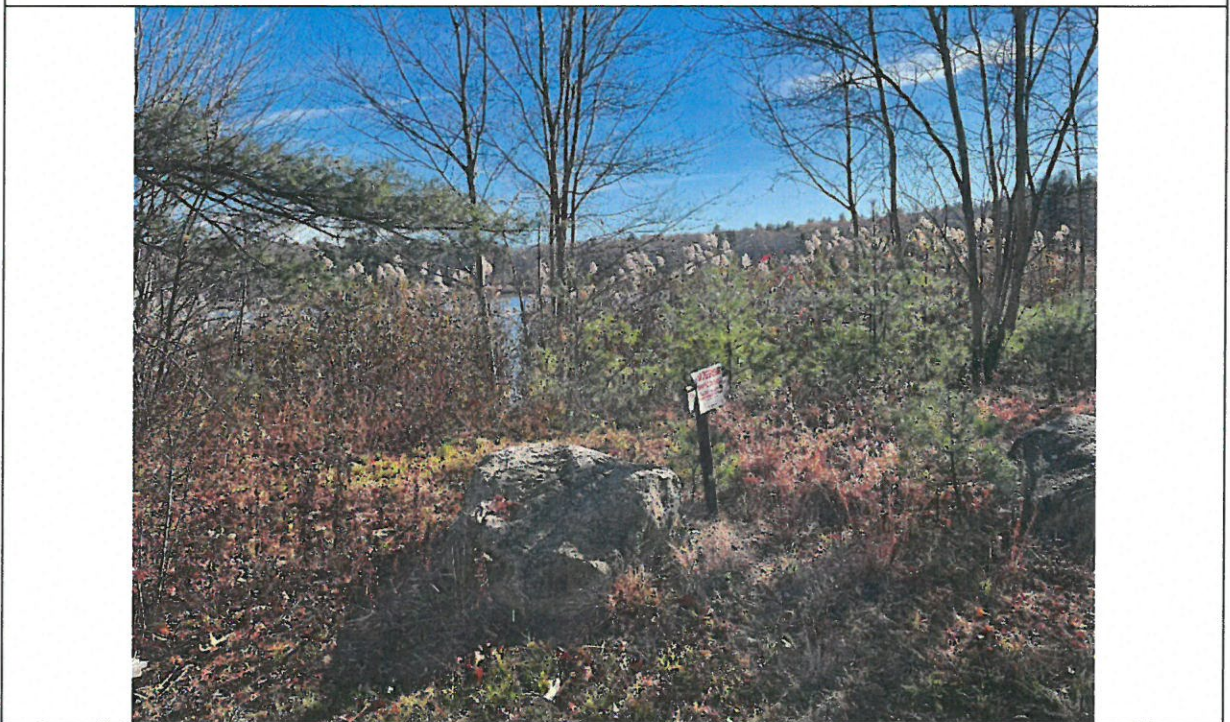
View of the dam upstream embankment and boulder line as viewed near the right abutment looking upstream.
